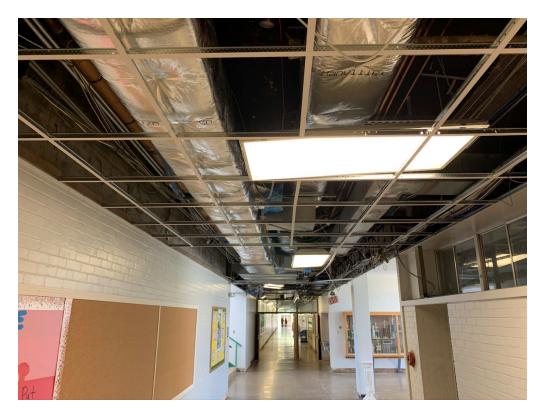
Corridor E-215 New Ducting is Not Coordinated with Lighting Layout
